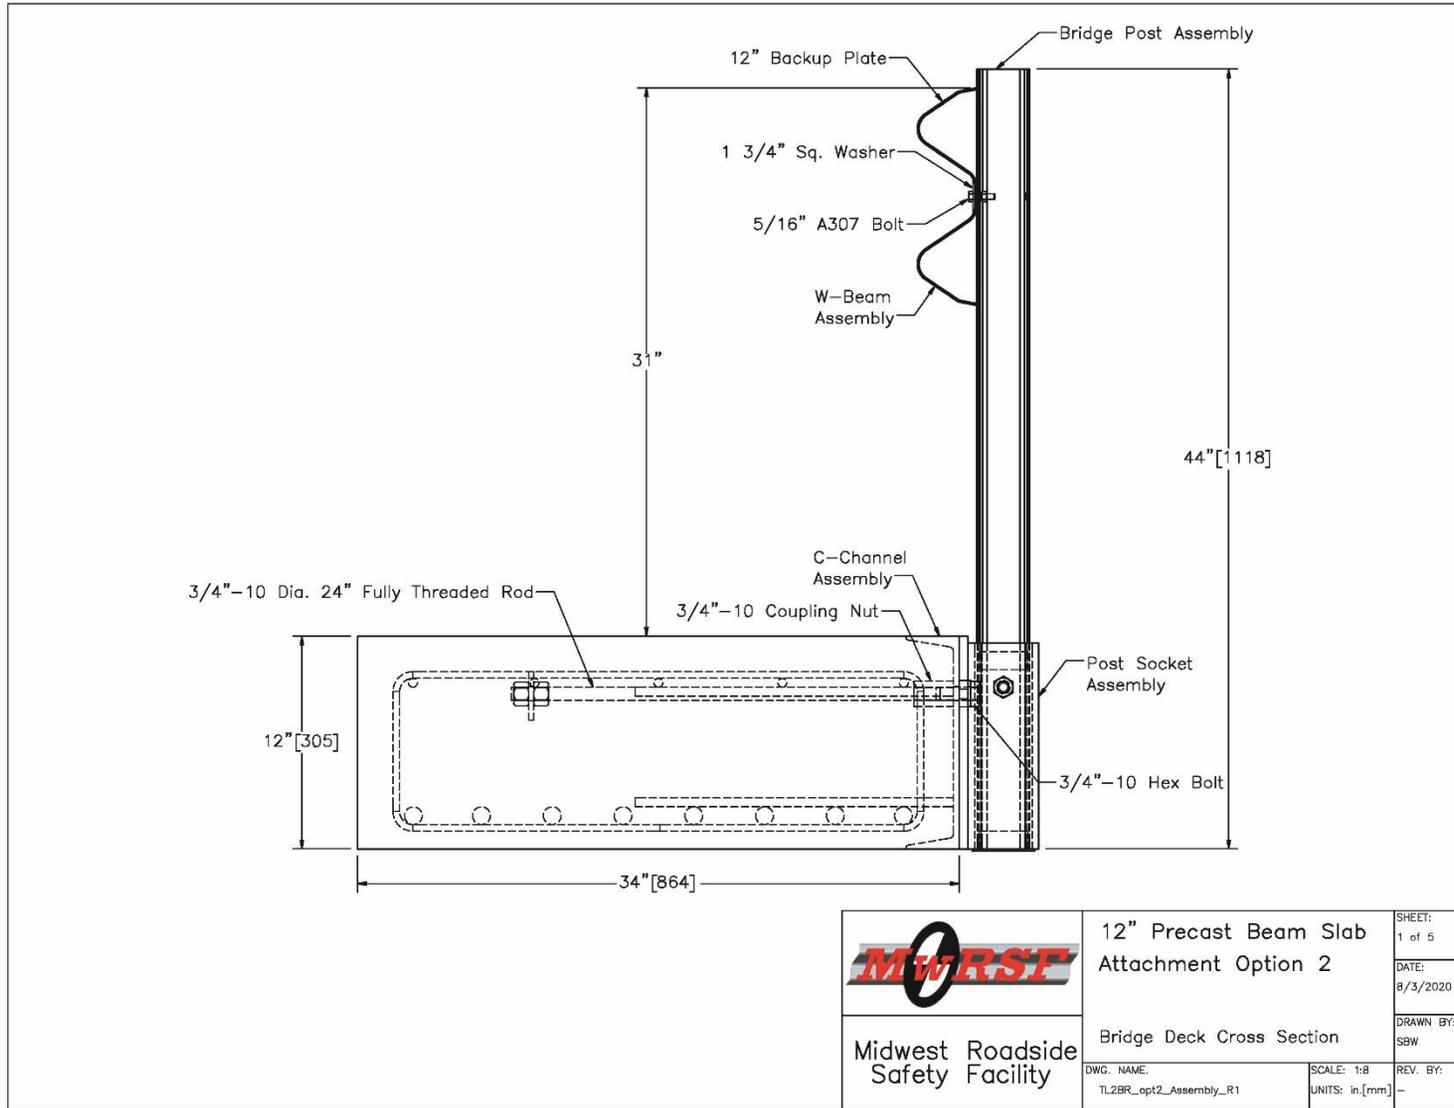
System Details, TL-2 Bridge Rail Attachment to 12-in. Deck, Option 2, Cross Section
